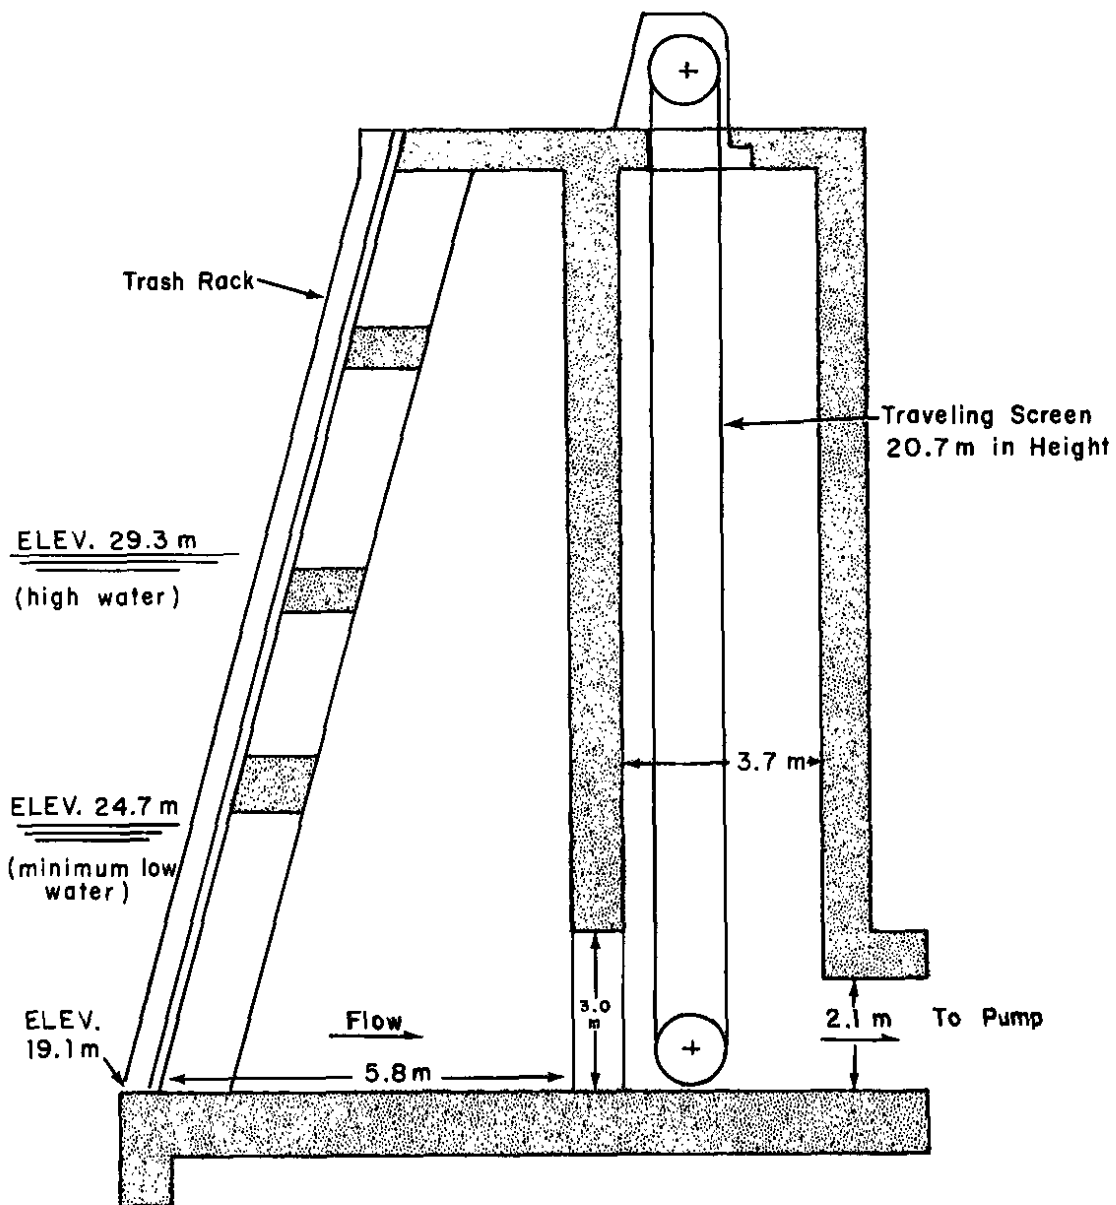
Schematic of 1G and 3G Pumphouse Intake, Elevation View
